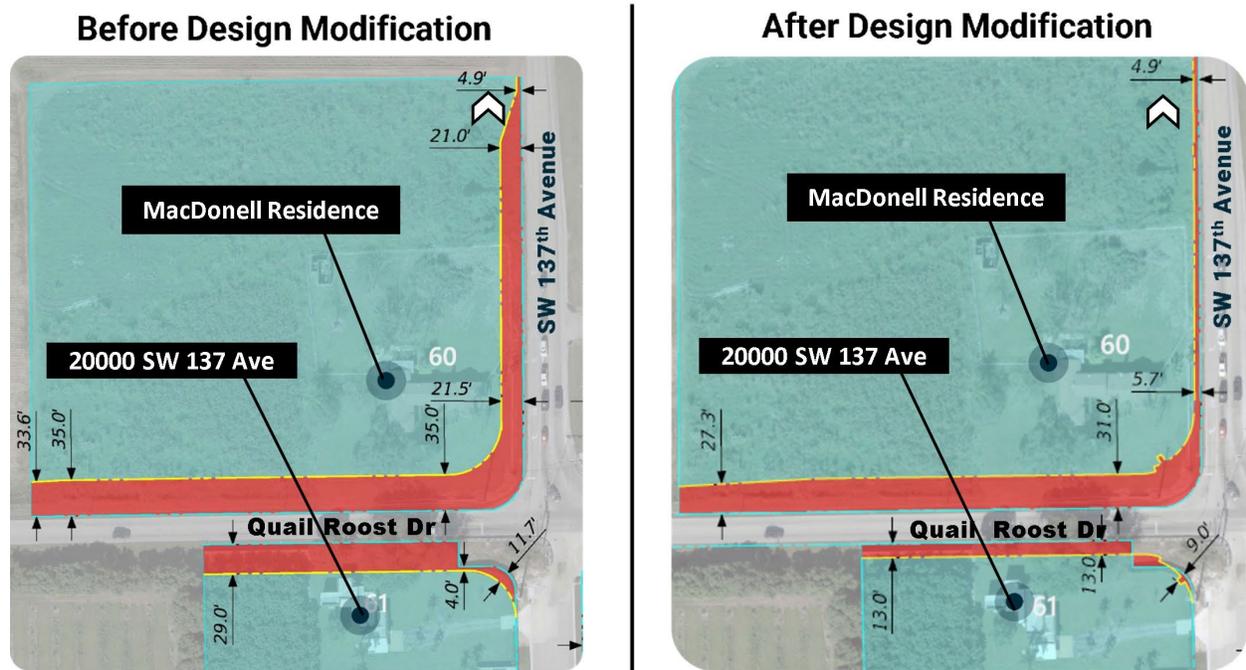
Build Alternative 2 Impact Minimization at SW 137th Avenue Intersection
